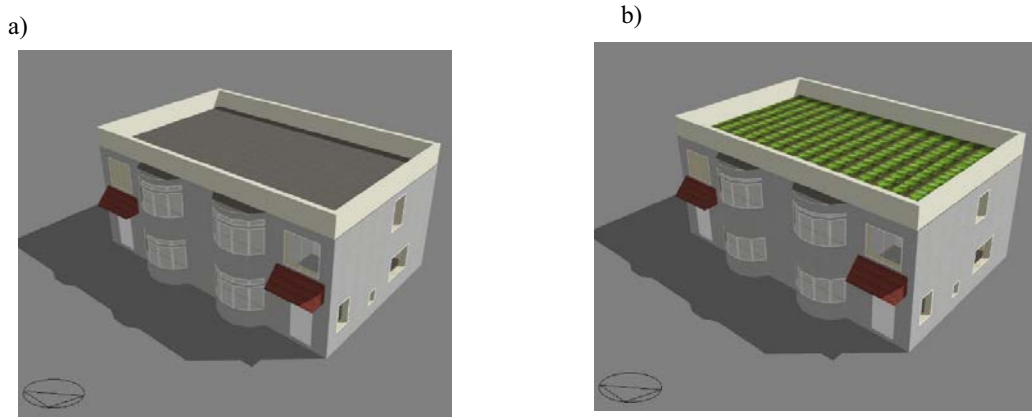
(a) residential building with traditional roof; (b) residential building with green roof.
